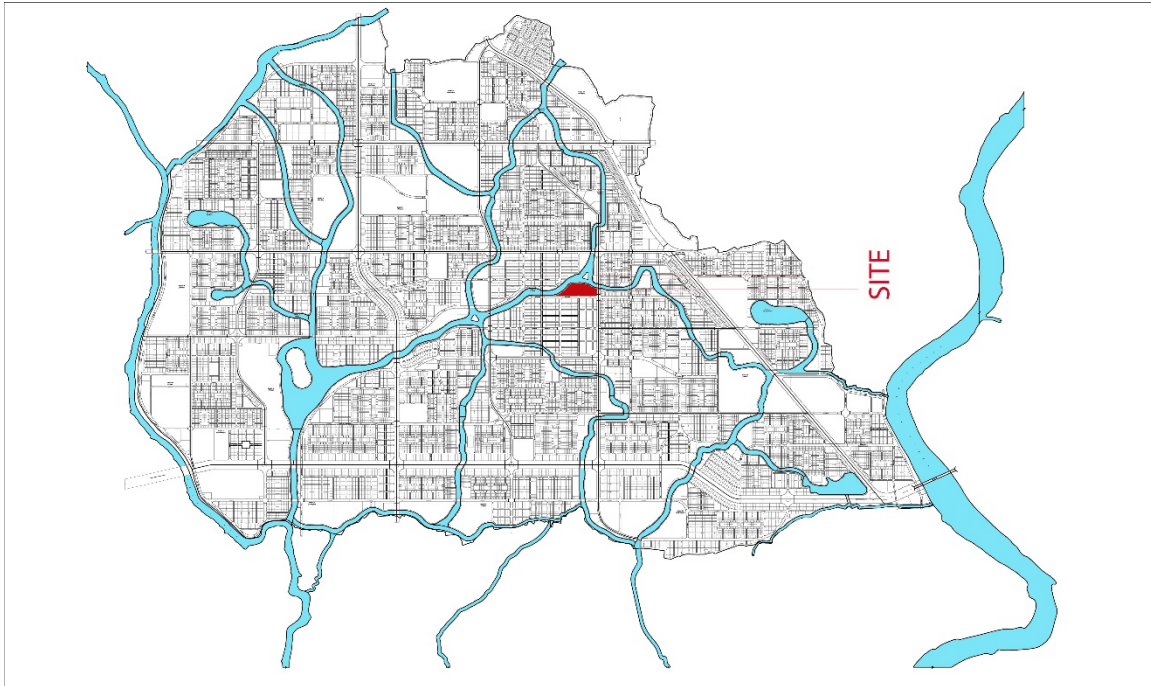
Road Network Layout and Water bodies of Purbachal New Town Project
